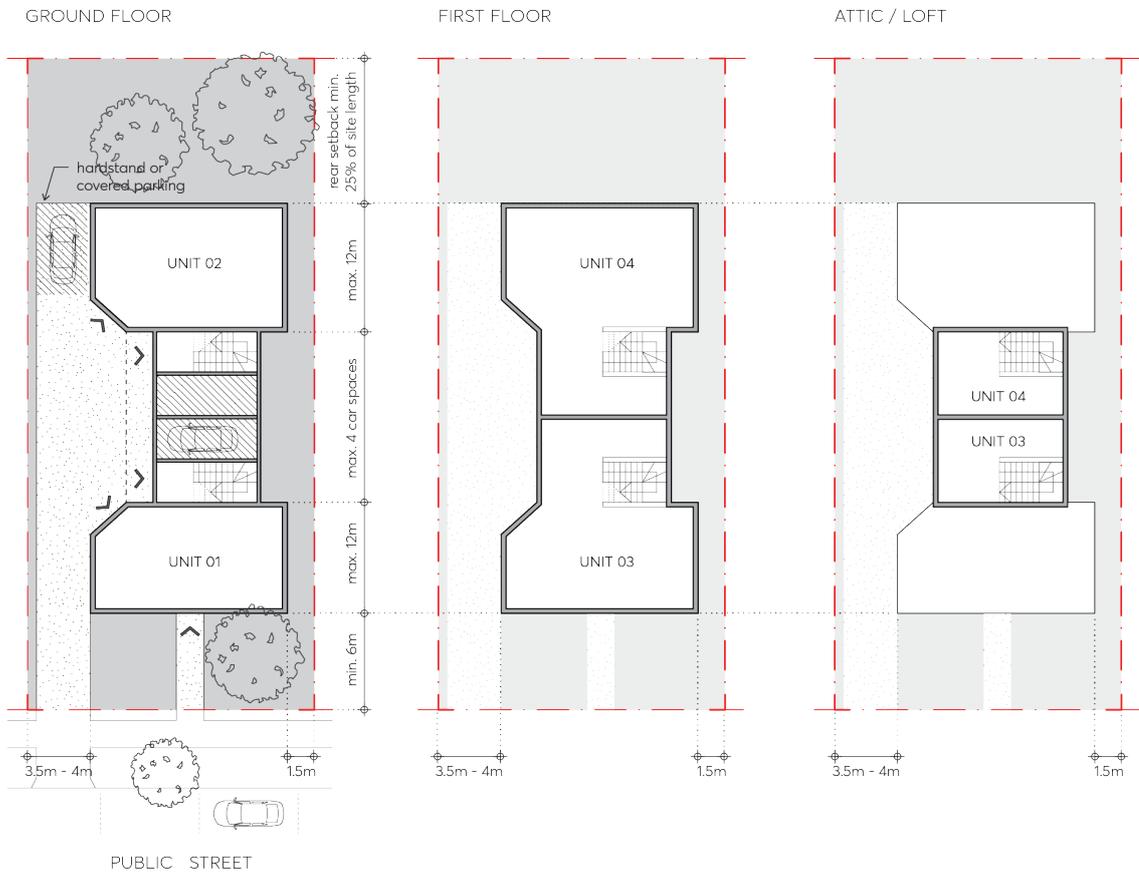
Site setbacks for manor houses with at grade car parking
